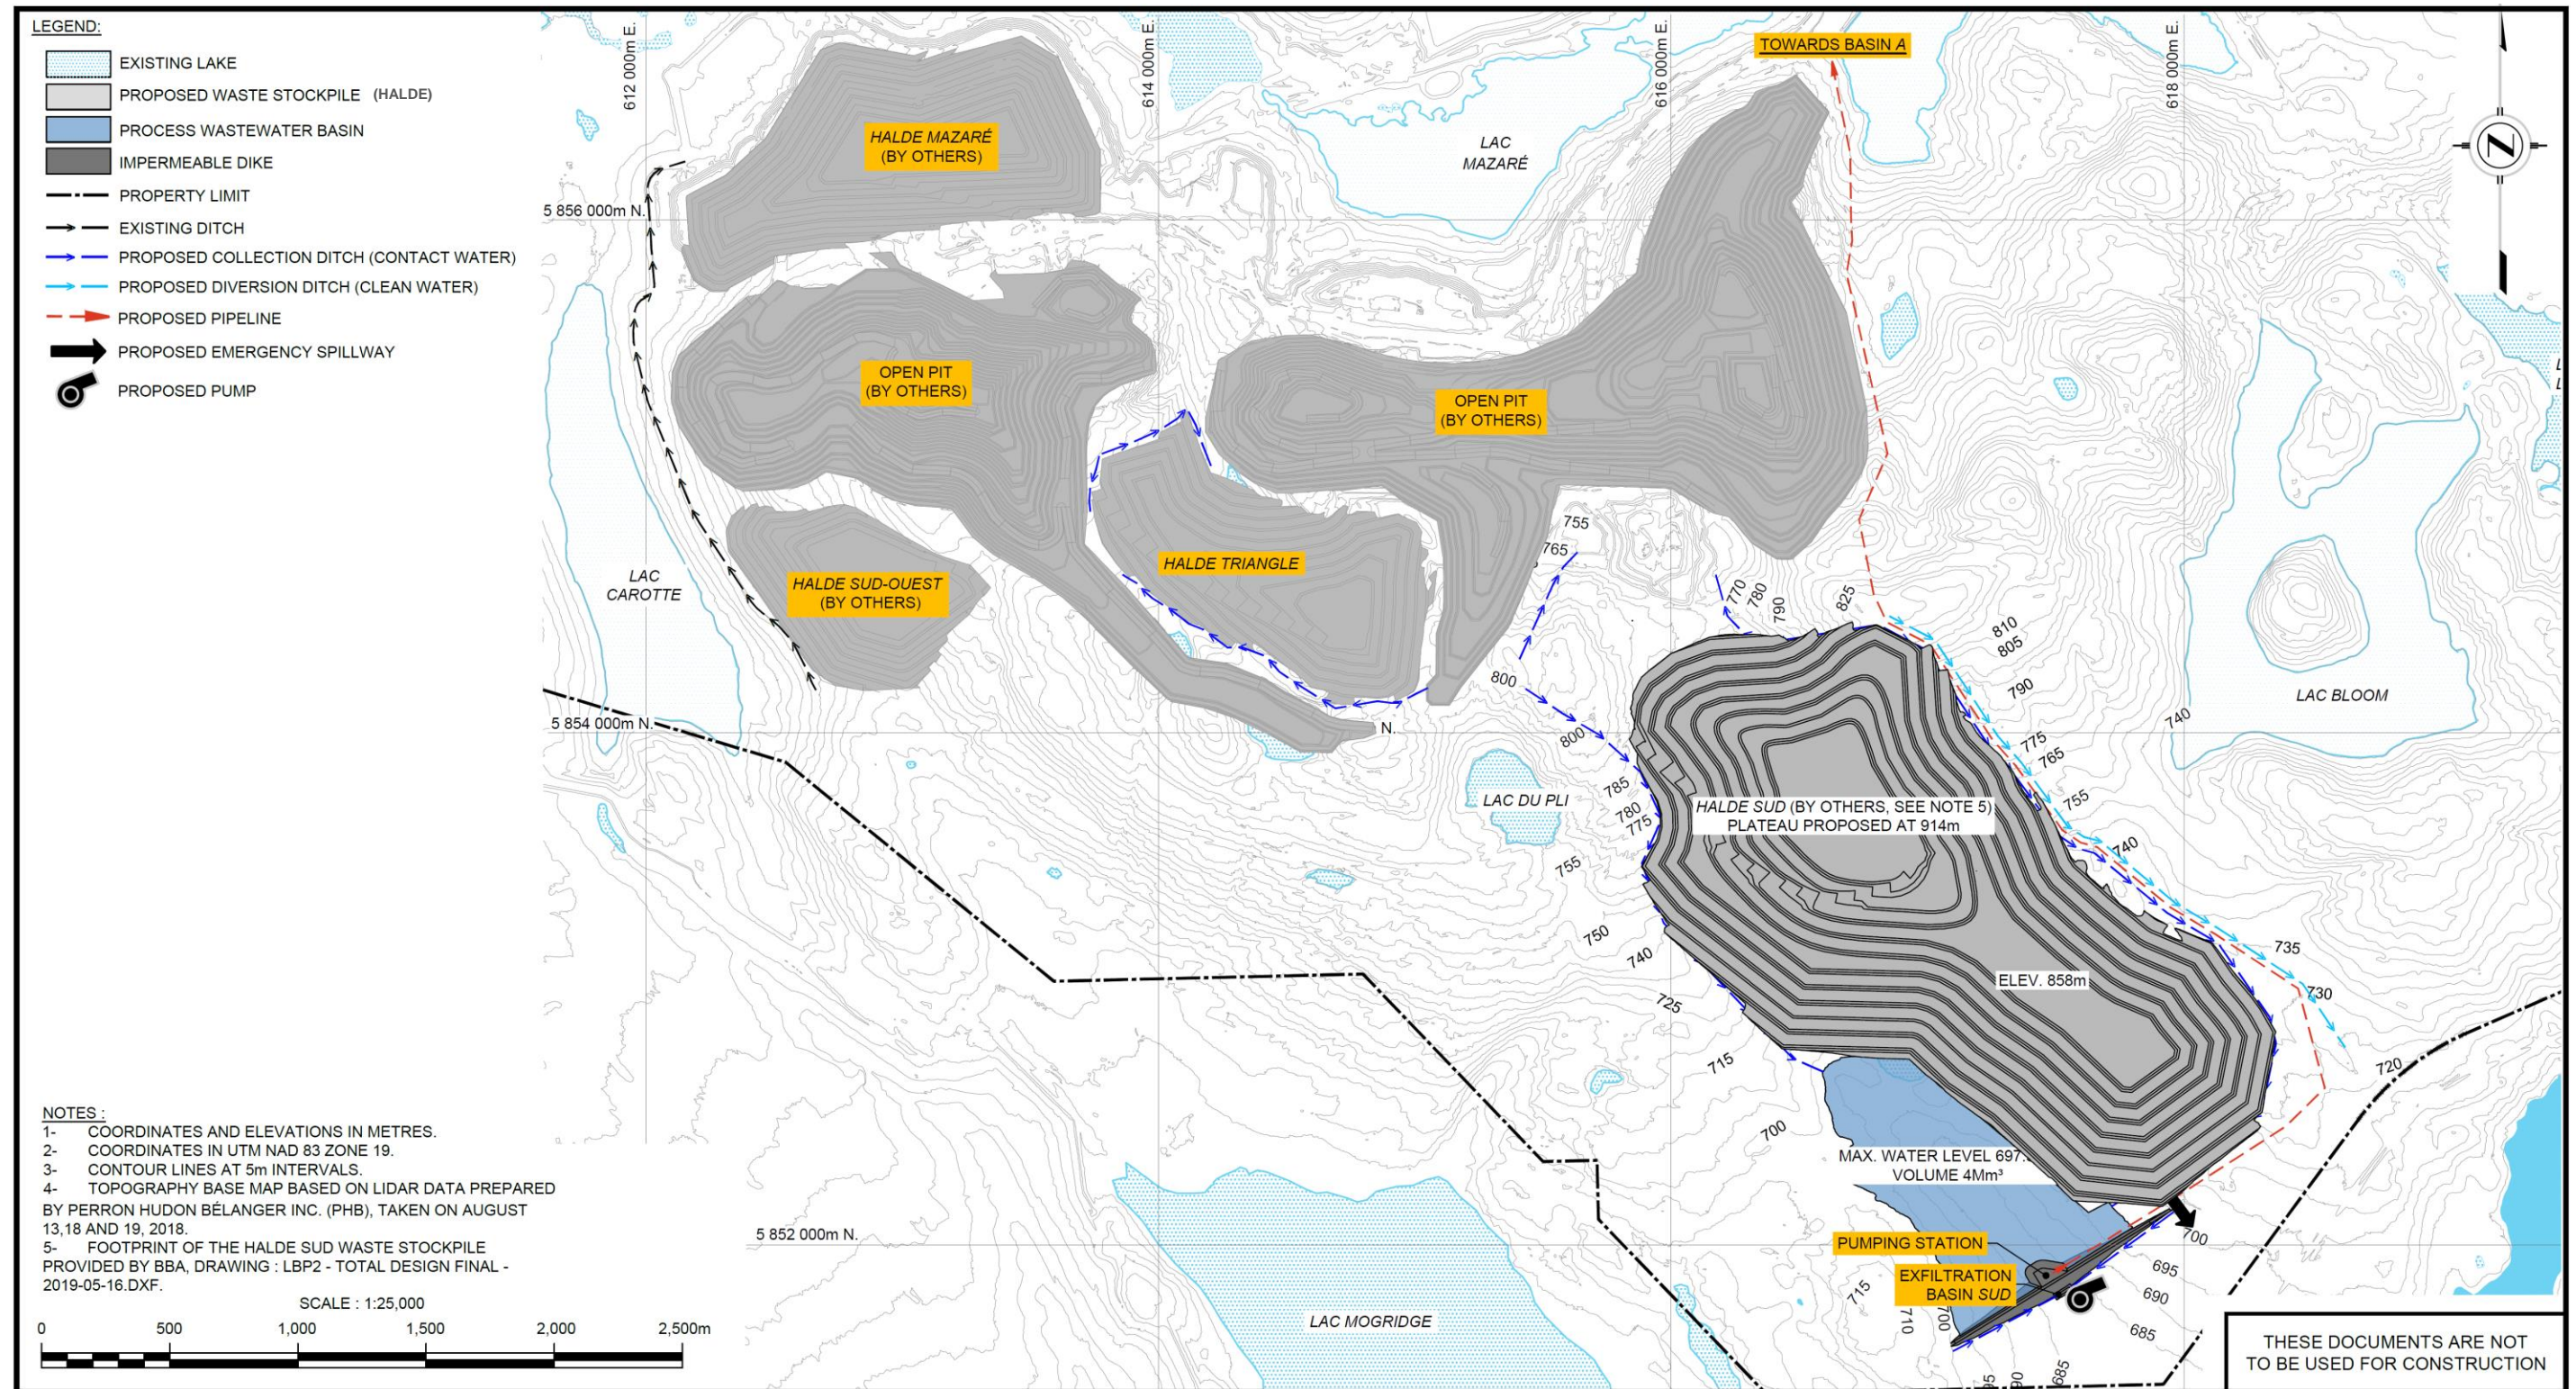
Water management infrastructure – Waste rock and overburden facilities
